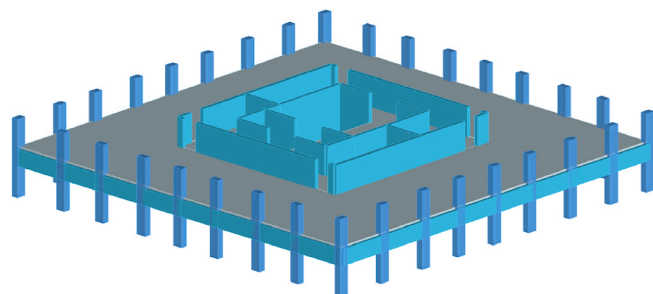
Schematic 3-dimensional illustration of the standardised typical floor plan used across building models.
